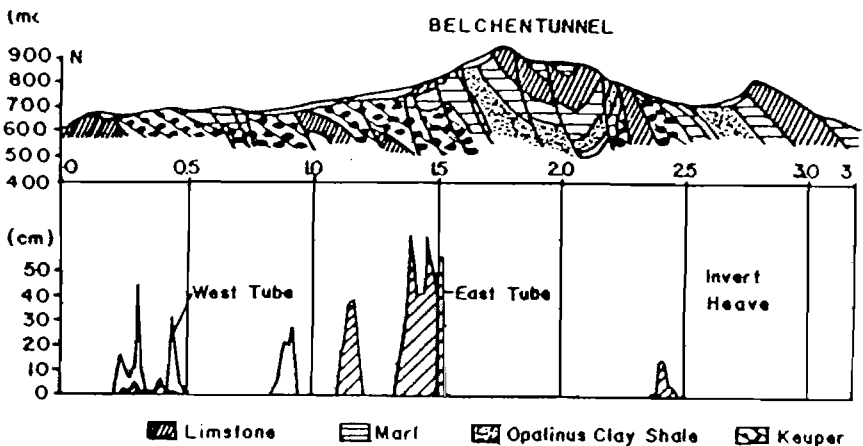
Belchen Tunnel: Longitudinal cross section and invert heave (from Grob, 1972).
